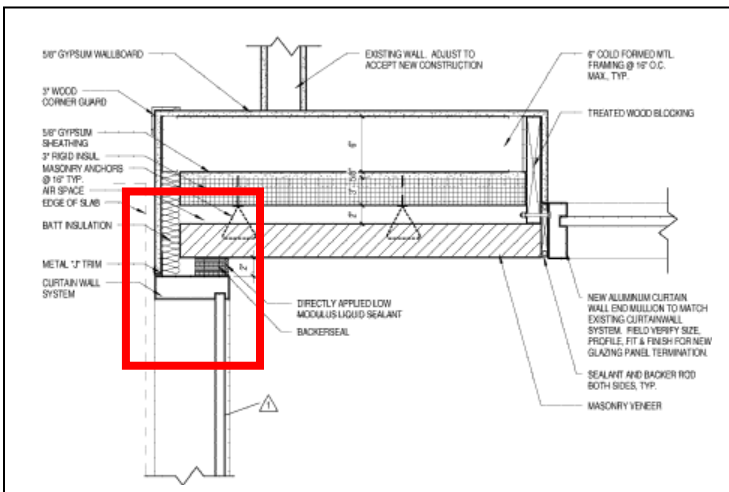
Masonry Veneer, Interior Finishes, and Curtain Wall Interface
